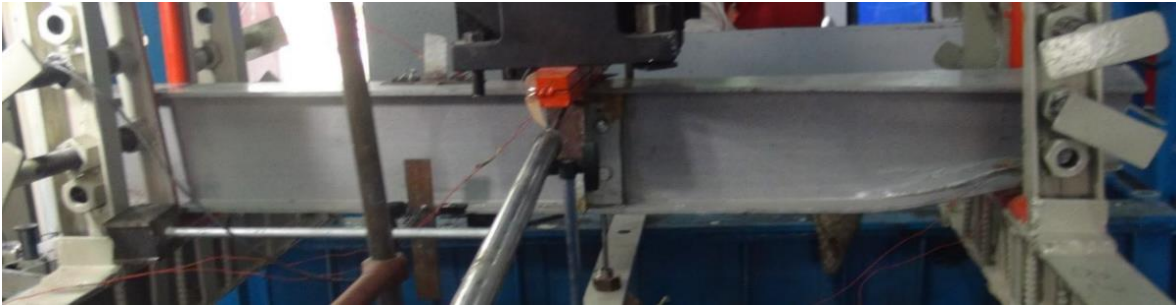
Failure mode of the beam with bonded and bolted stiffener under three-point loading (7B-TS-F).
